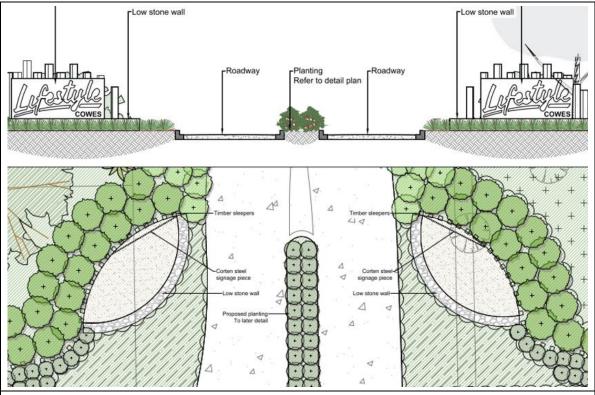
Proposed Signage by John Patrick Landscape Architects
